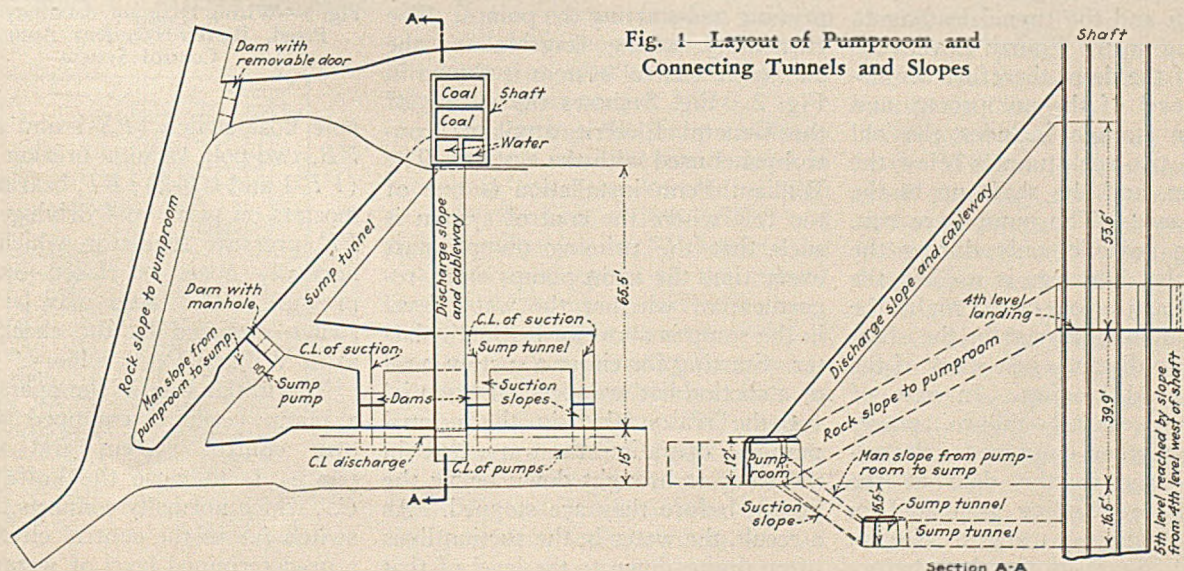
Layout of Pumproom and Connecting Tunnels and Slopes
